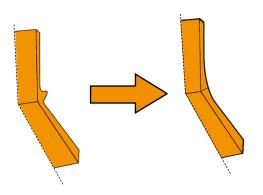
INSTALLING A CUSTOM-MADE STARTING FLASHING
